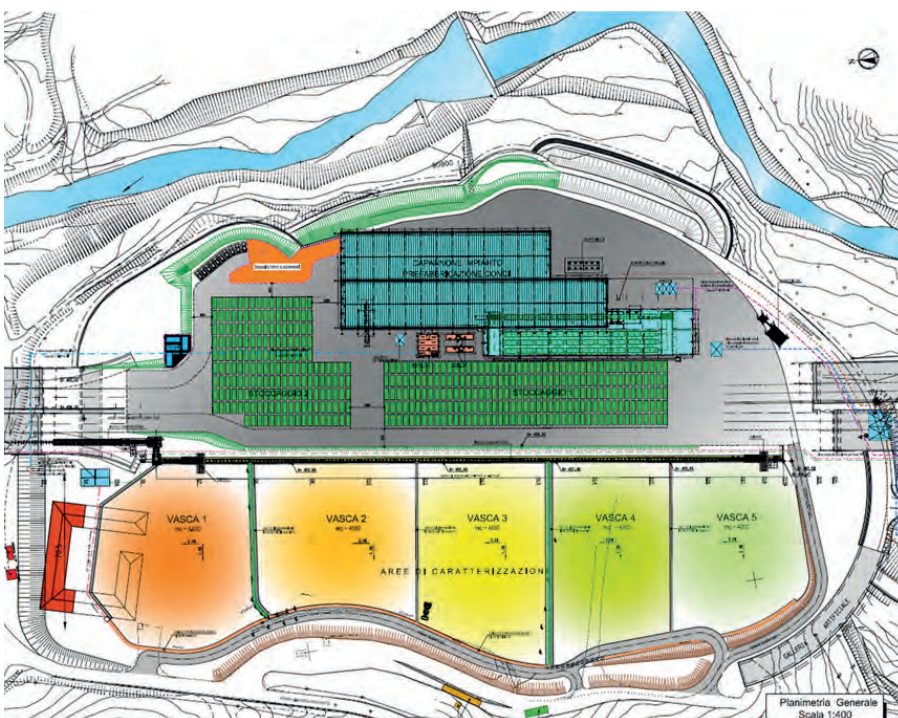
Sparvo Tunnel Project – Plan View Rendering of Precast Plant and Spoil Storage
